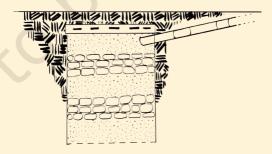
A drum placed in a soakpit and connected with pipe (cross sectional view)
